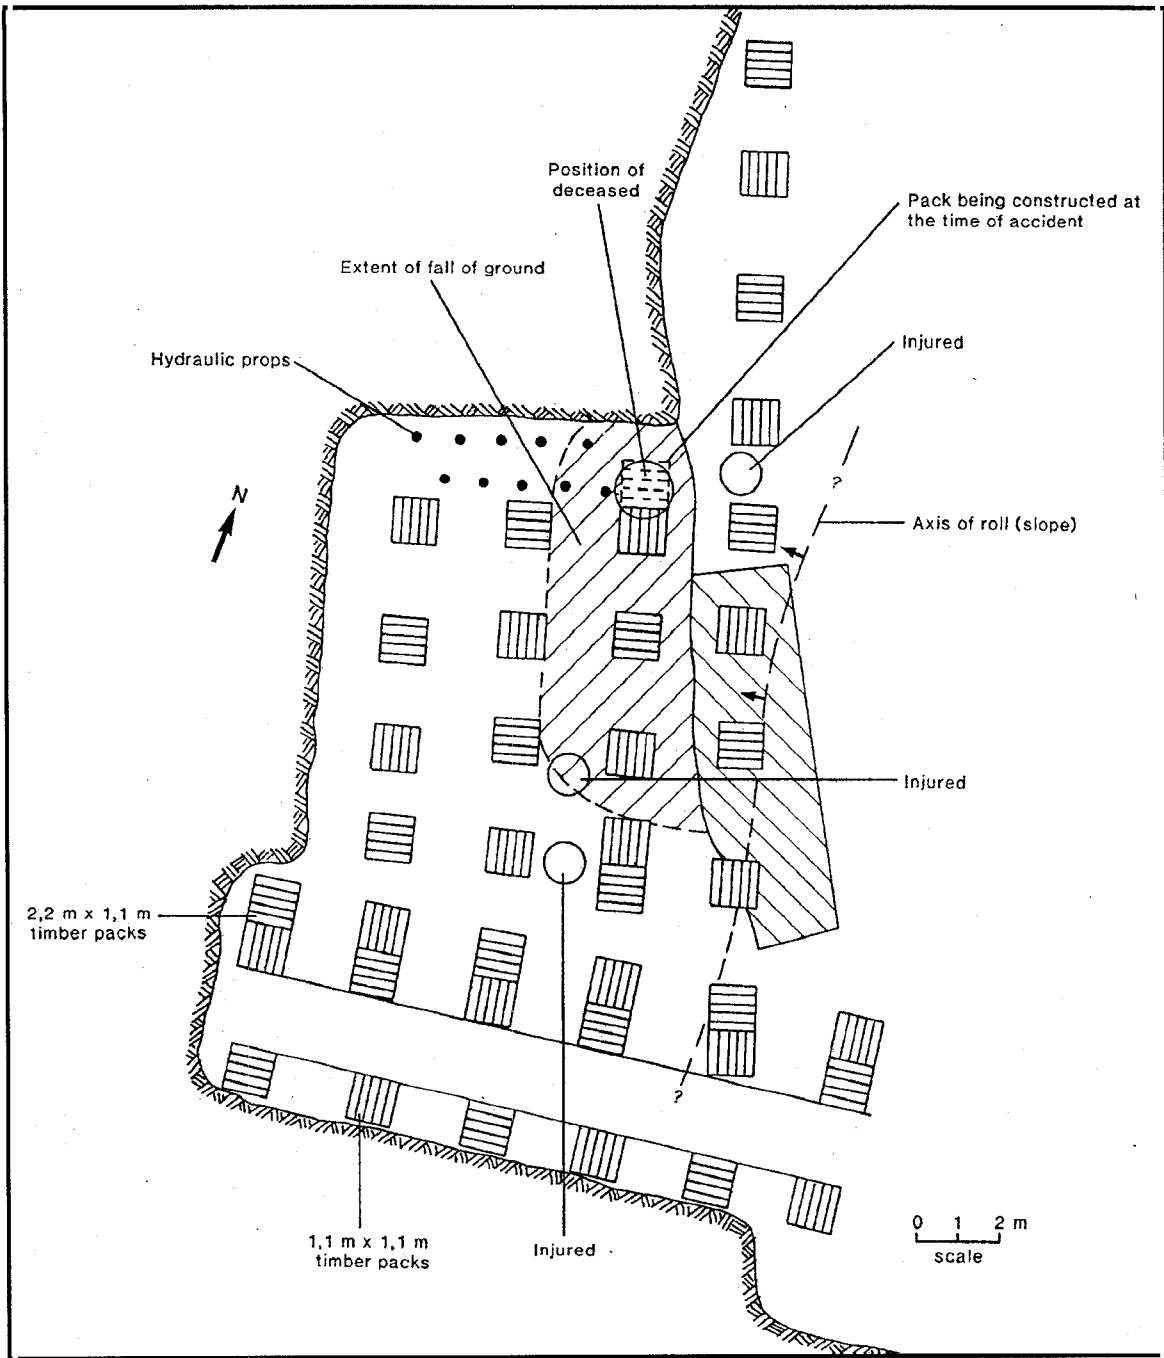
Plan showing the support installed in the 21-3E VCR 1W Up-dip working place at the time of the rockburst, and the extent of the fall of ground.
